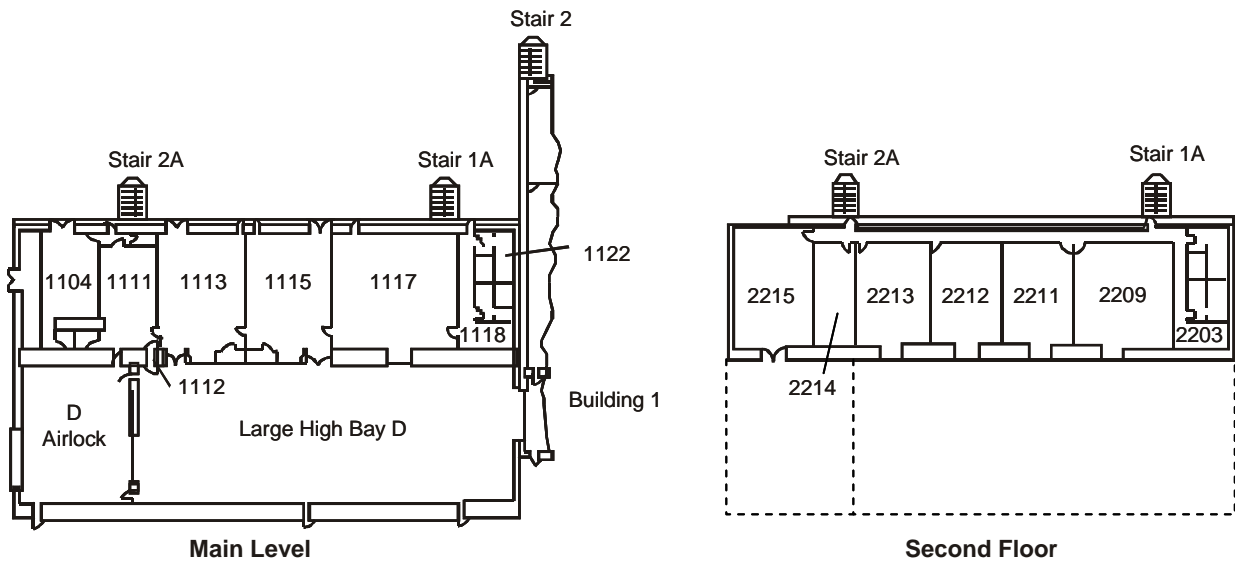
Astrotech Building 1 Detailed Floor Plan
